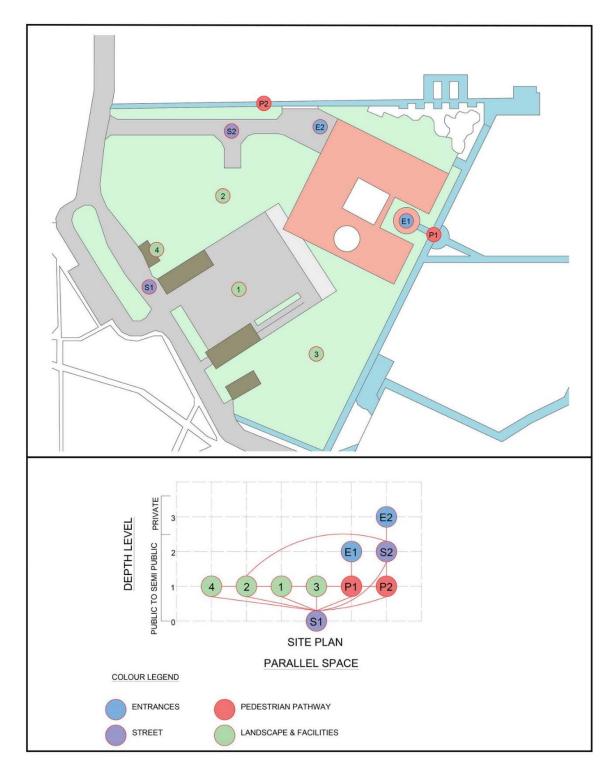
Redrawn Site Plan and Justified Graph of Site Plan for SCCC Learning Resource Center
